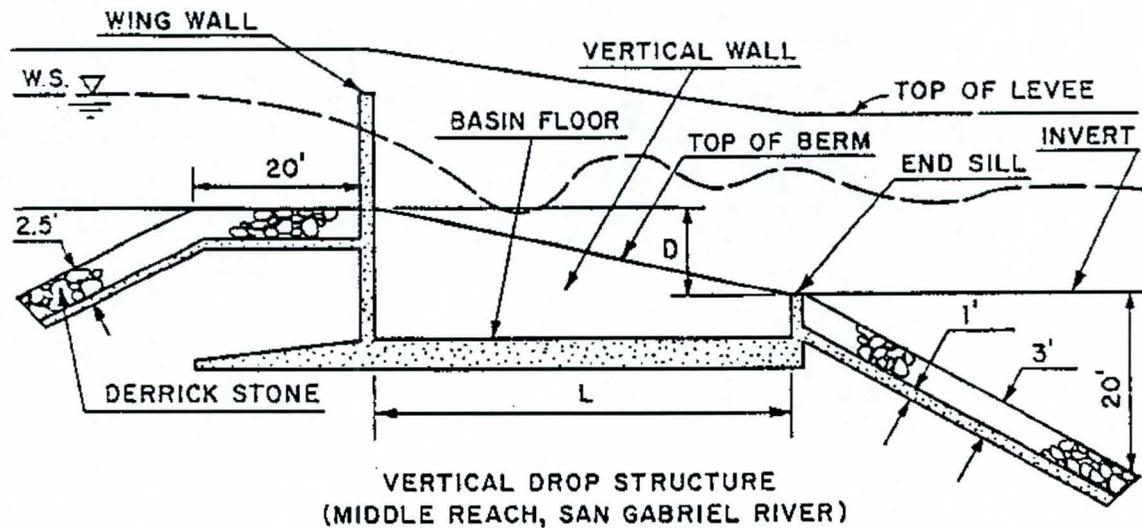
Design layouts of vertical drop structures: San Gabriel River (after Robles 1983).
